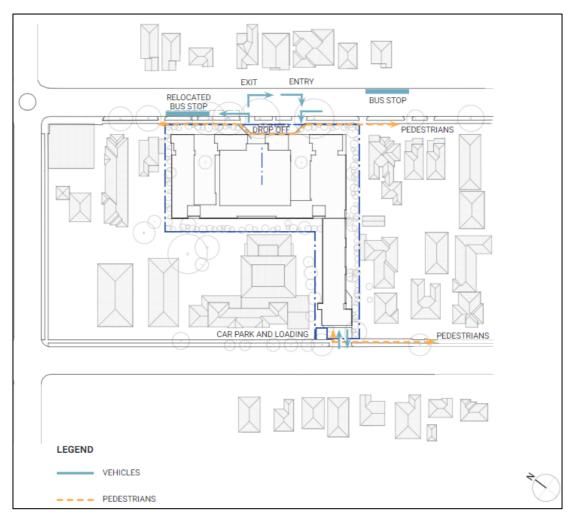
Proposed Pedestrian and Vehicular Access Arrangements Source: O'Neill Architecture
